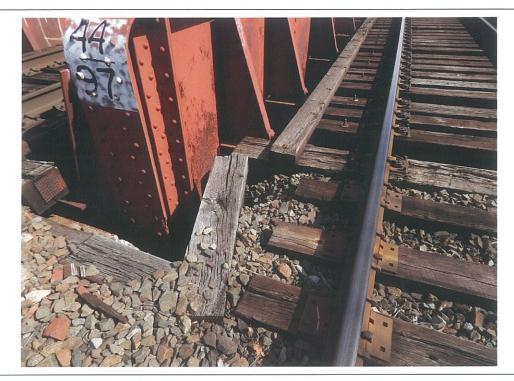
Displaced ballast retainer at the west end of Girder G3 on Track #2, looking northeast.
